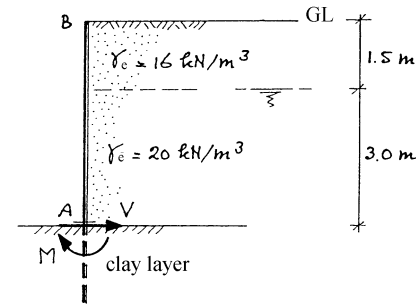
A sheet-pile wall is located in a relatively impermeable layer of clay 4.5 m below ground level. The groundwater level behind the sheet piling is 1.5 m below ground level. The specific weight γ_c of the soil (dry and wet) behind the wall is given in the figure.
